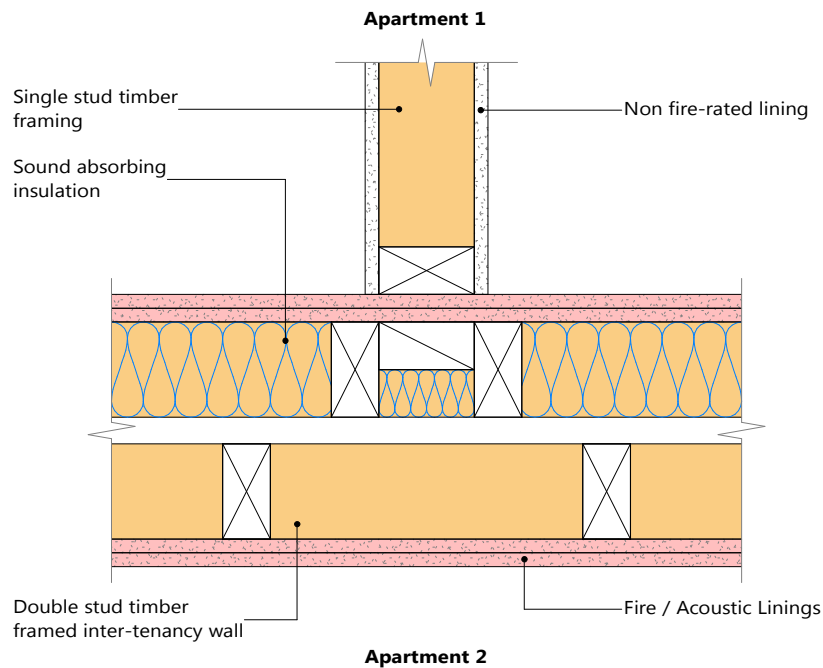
Double-stud intertenancy wall / non-loadbearing internal wall junction
